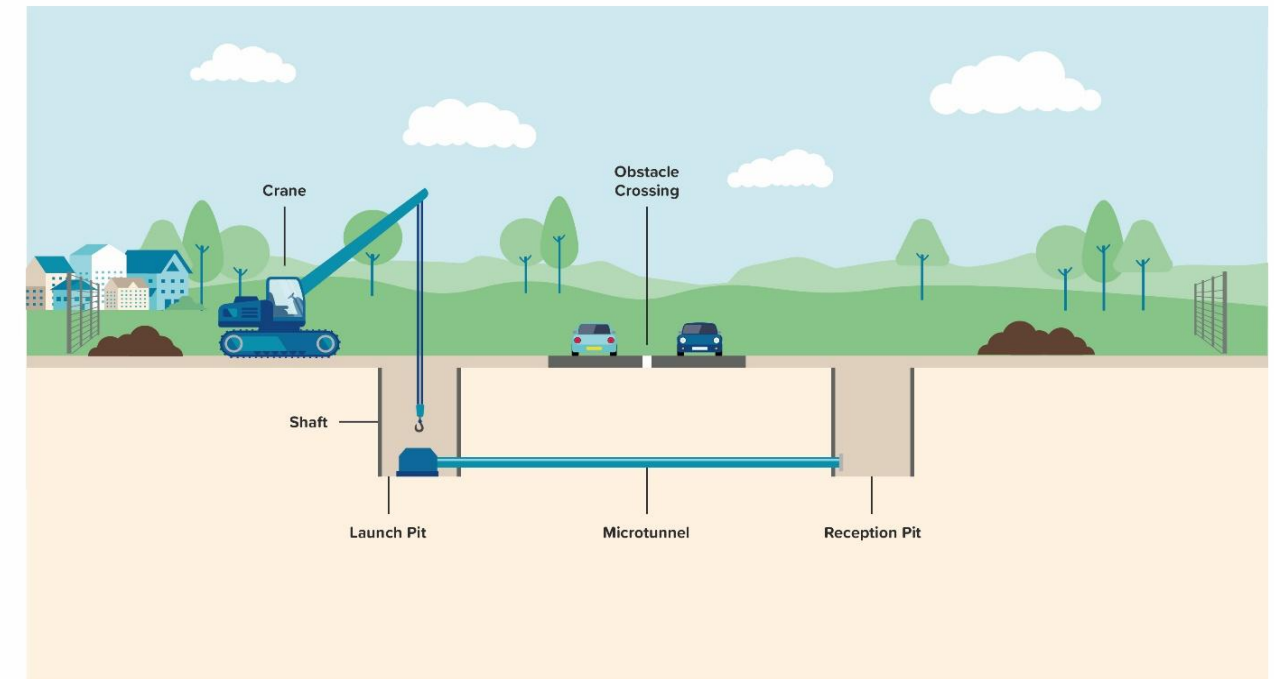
Indicative Cross-Section of Trenchless Duct Installation (showing alternative techniques to HDD such as micro-tunnelling or pipe-jacking.)
